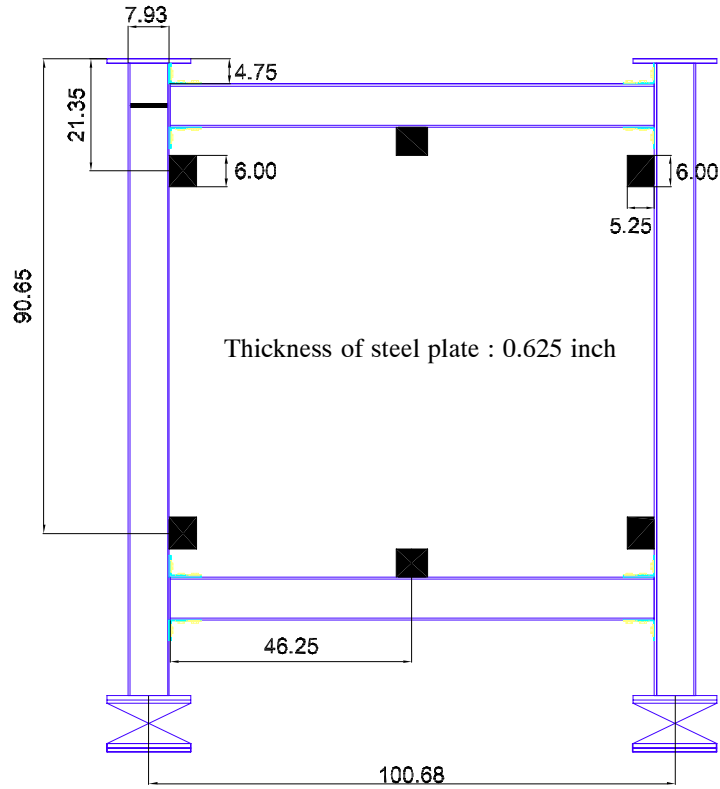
Configuration of Out-of-plane Supporting Steel Plate (unit=inch)
